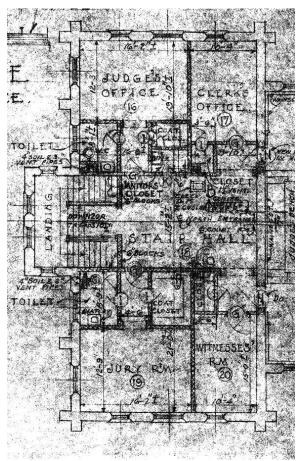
, Fredericksburg Courthouse, Detail, North wing, second floor. J. Binford Walford & O. Pendleton Wright, Renovation drawings, 1948. Courtesy City of Fredericksburg.
